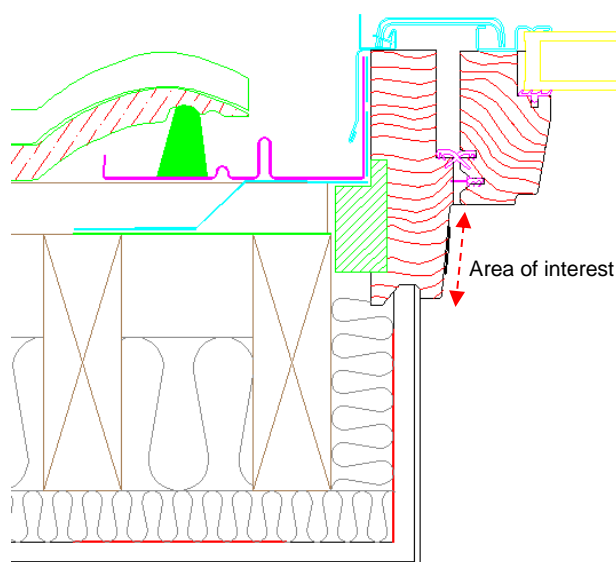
The frame, together with the neighbouring roof construction, sash and glazing.
